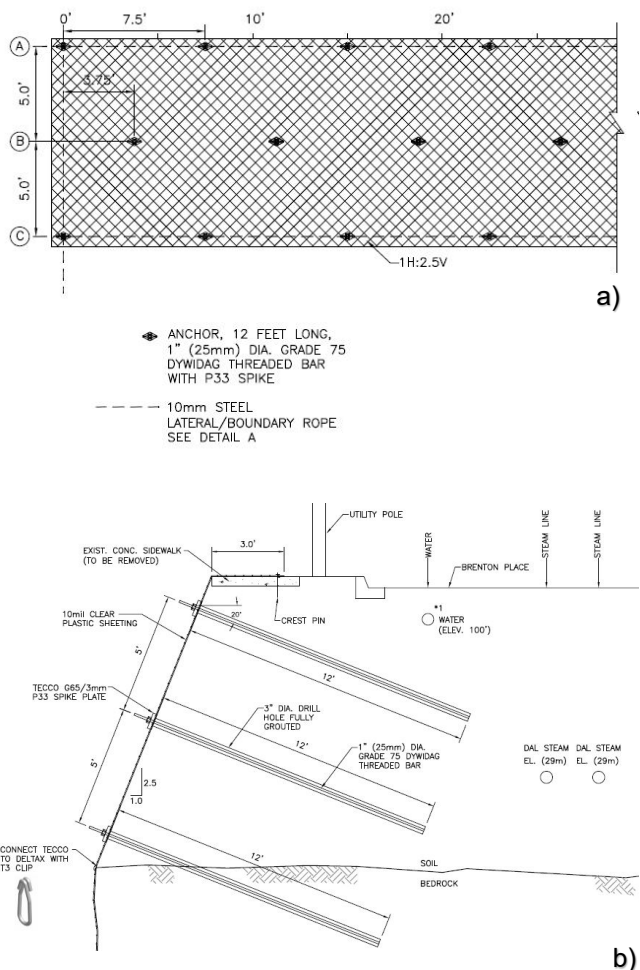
(a) display's an elevation view of the final TECCO G65/3 high-tensile wire with offset anchor dimensioning; (b) displays a cross-sectional view of the final design
